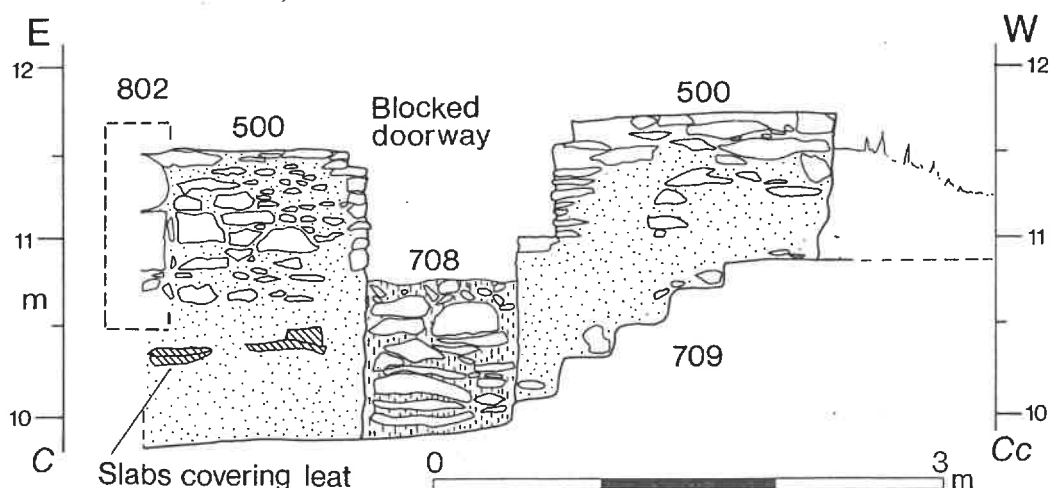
Amlwch, New Haven. Details of blocked door in structure 500 and steps on north side.
